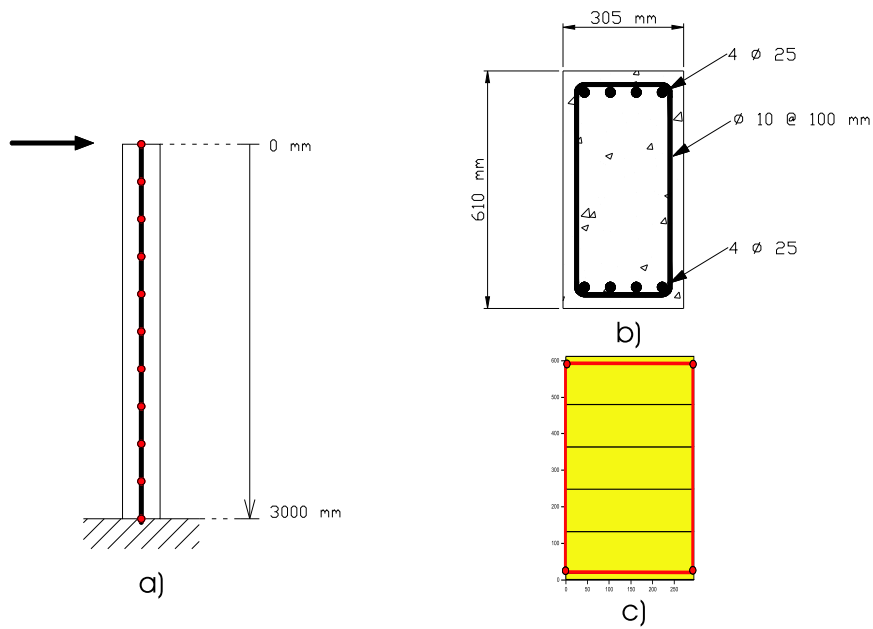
RC cantilever. a) test configuration, b) cross section, c) section discretization.
